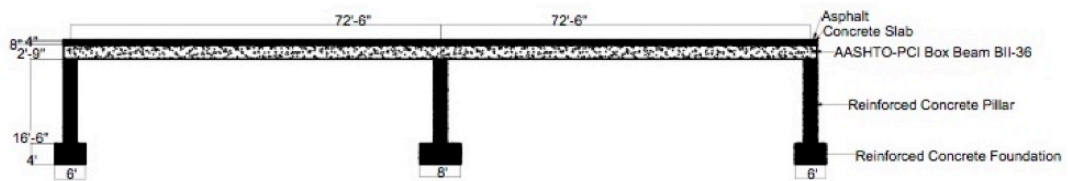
Double span, prestressed concrete spread box beam bridge (Case #6).
